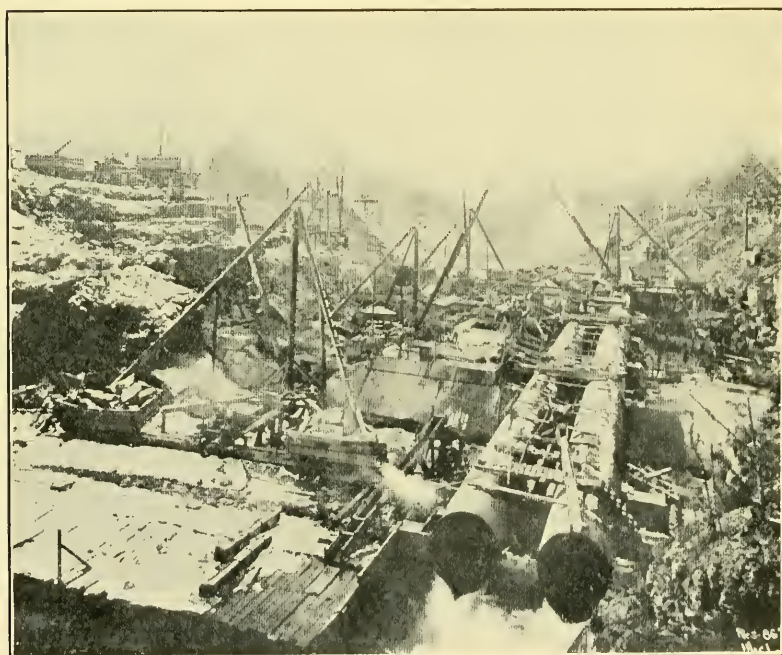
OLIVE BRIDGE DAM, LOOKING UP STREAM.
